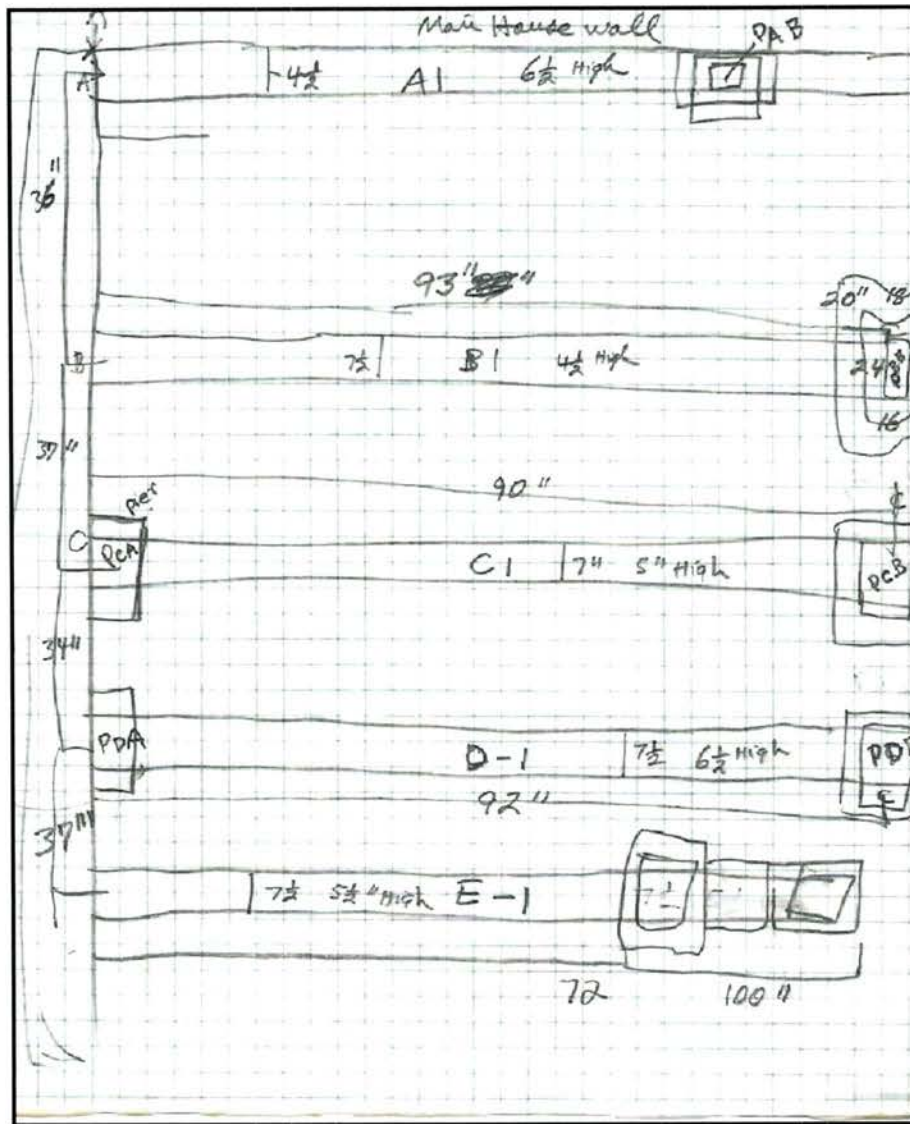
Undated plan showing the eastern end of the crawlspace. Floor joists and piers are shown. No excavation appears to have occurred in this area. The figure is oriented with south at the top.
